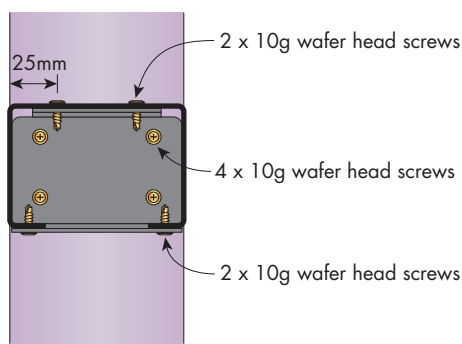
Header to Jamb Stud Connection for Prefabricated Door Frames
